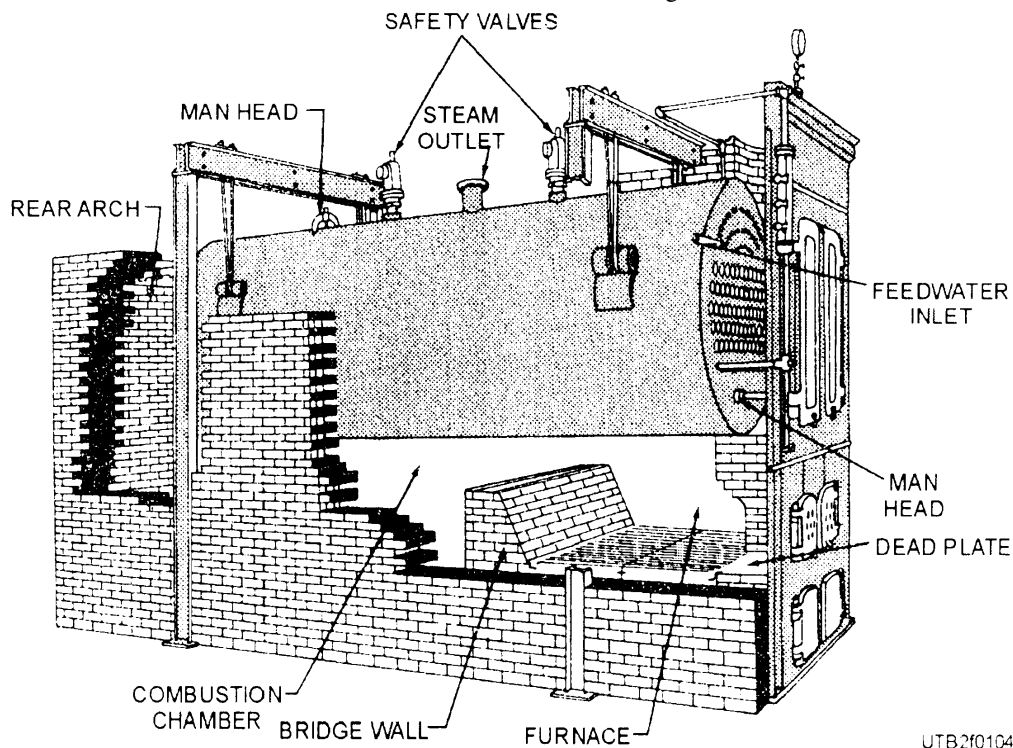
Horizontal return tubular (HRT) fire-tube boiler.
